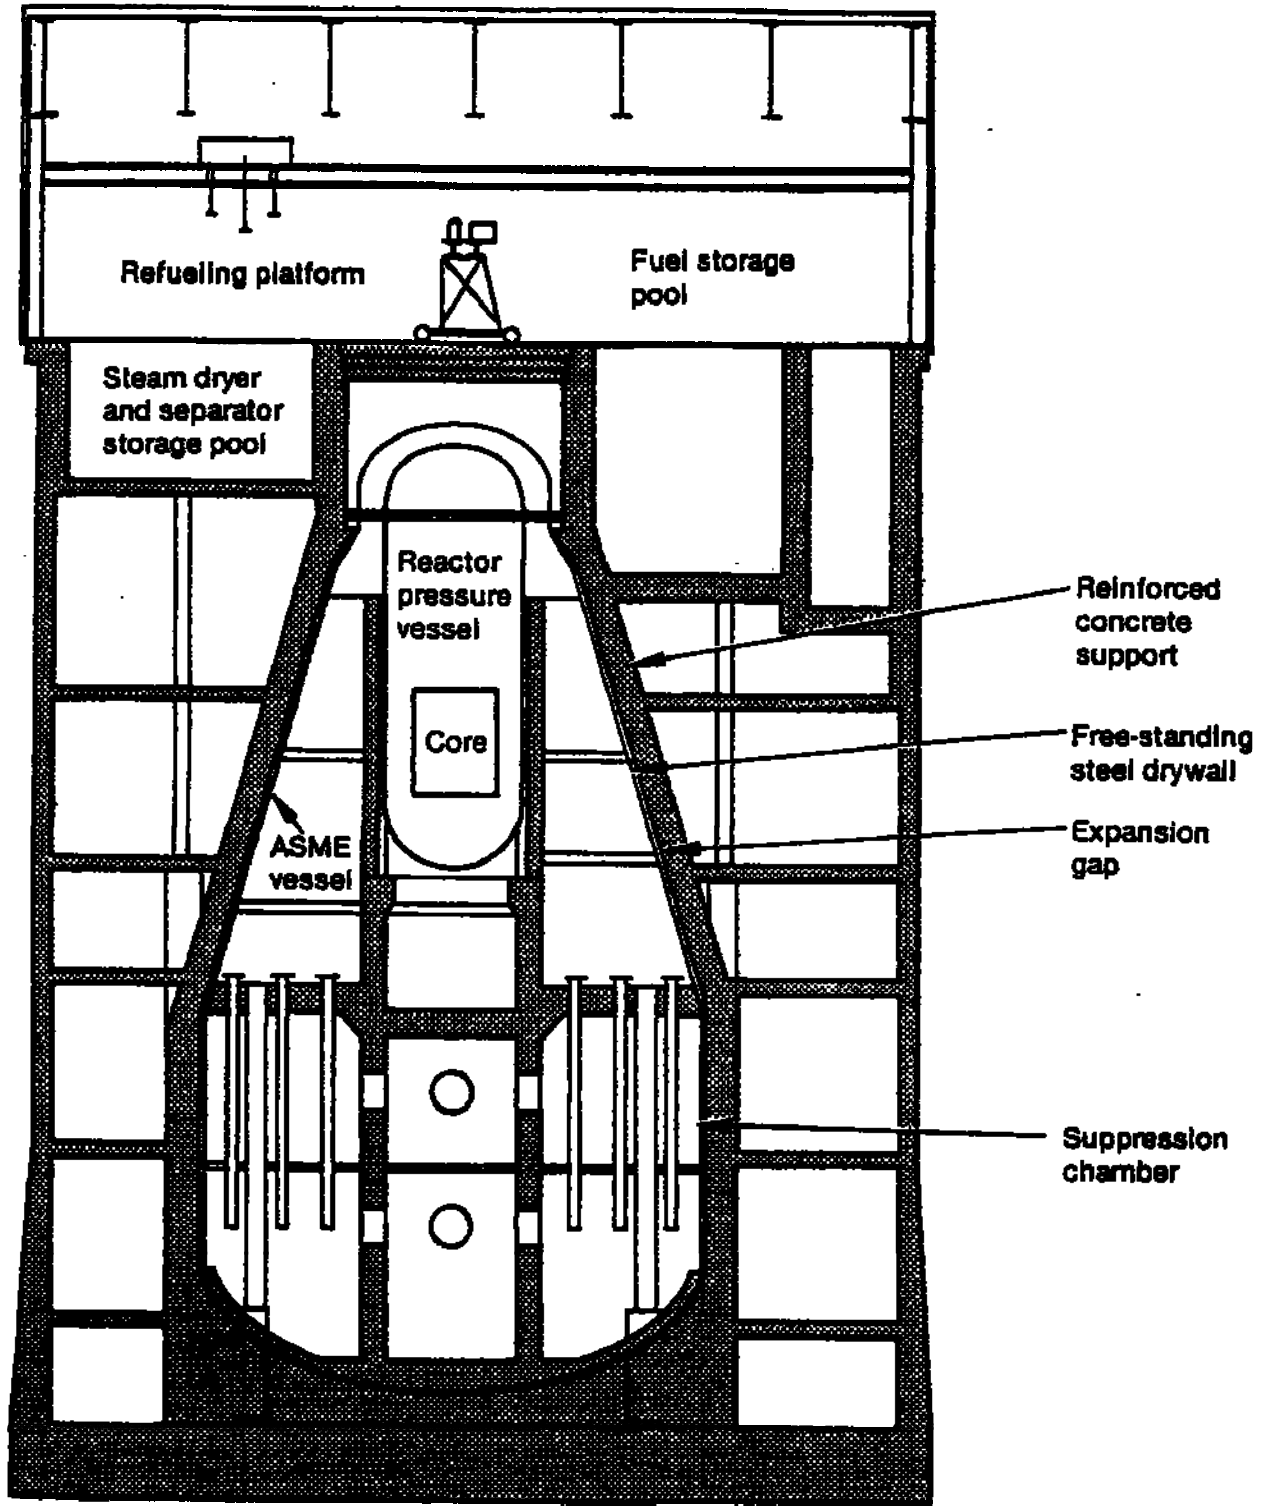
BWR Mark II Steel Containment with Concrete Shield Building (Columbia, previously WNP-2)
